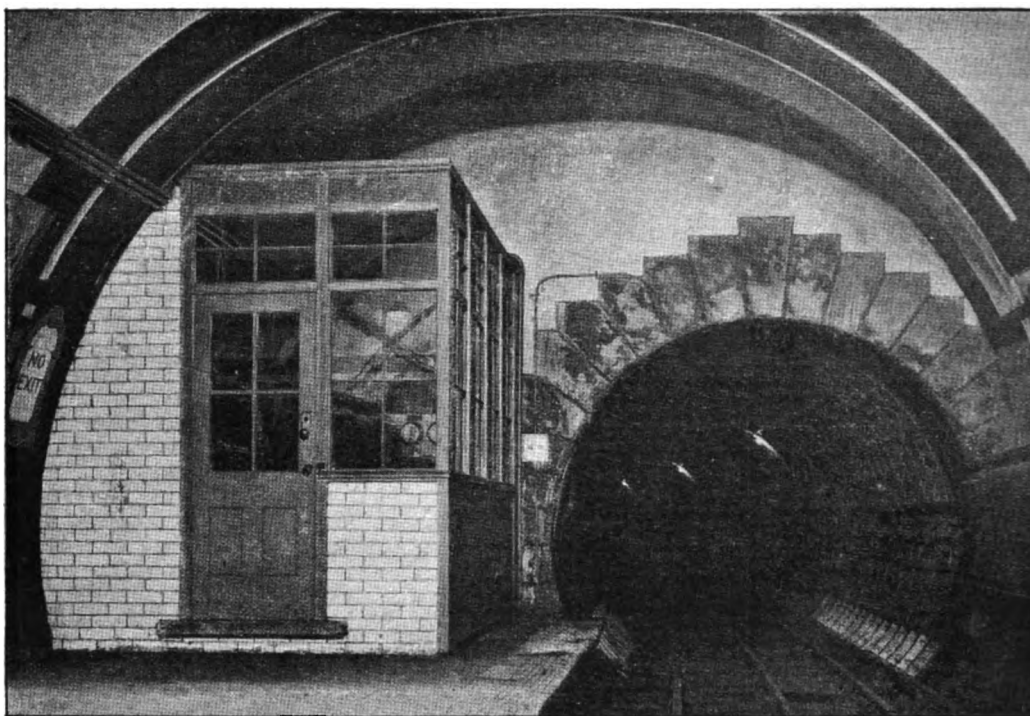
Kennington-road cabin; Baker-Street and Waterloo Railway.
